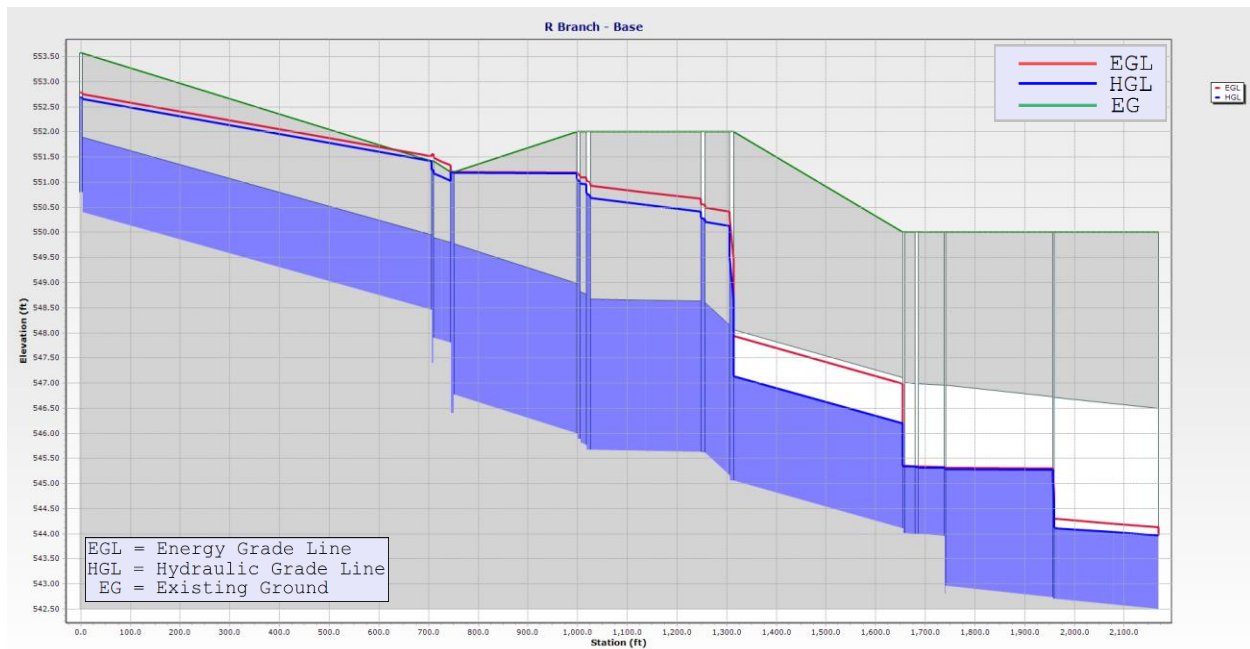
Proposed Bowie Street Pipe Profile (25-YR Storm Event)
